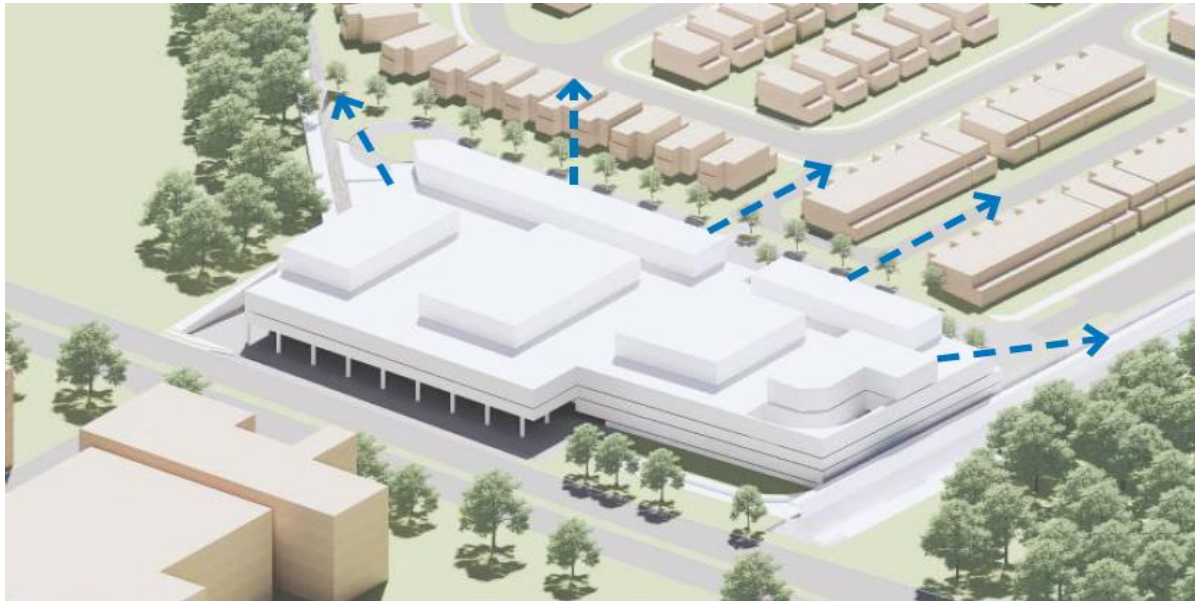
3D Aerial view of proposal as viewed from Newbridge Road frontage (Source: Rothelowman Planning Proposal Design Report)
